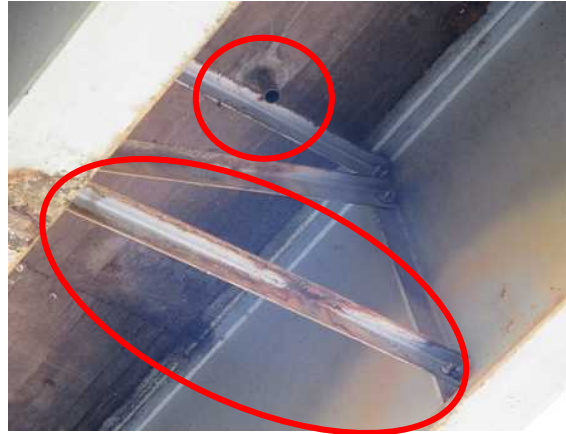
Corrosion occurred under the outlet of a drain pipe
